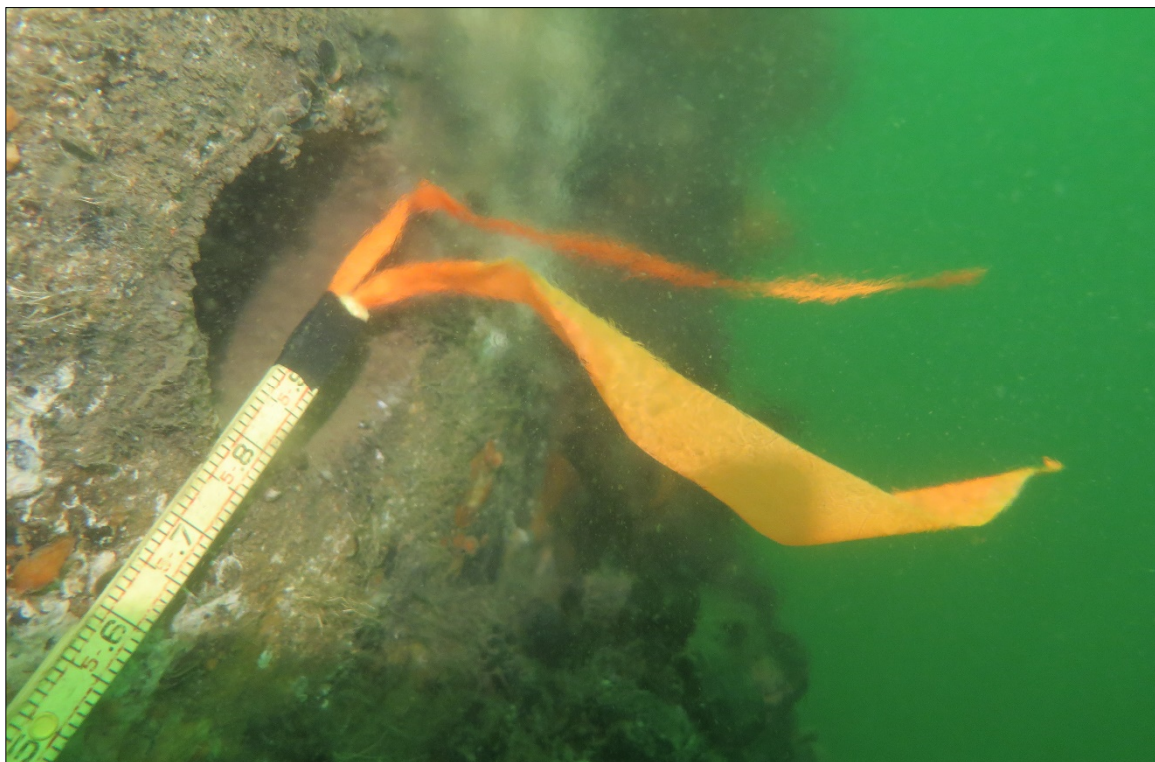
Typical flow at outlet port with telltale flagging, taken at Diffuser E29 north outlet port.
